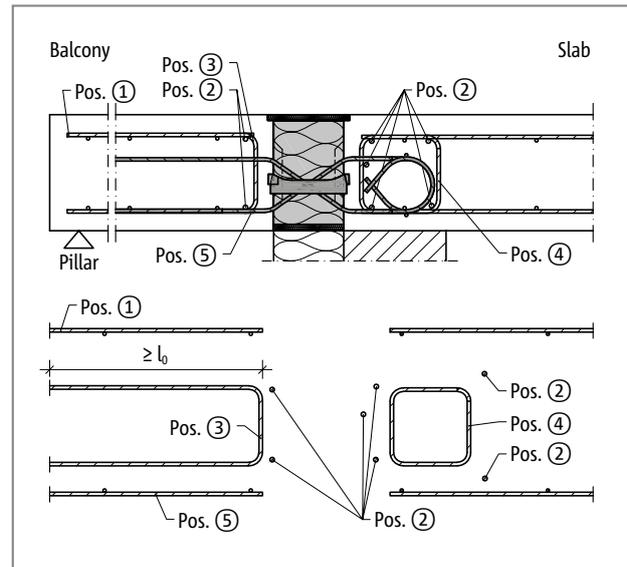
Schöck Isokorb® XT type Q-VV1 to VV4: On-site reinforcement
